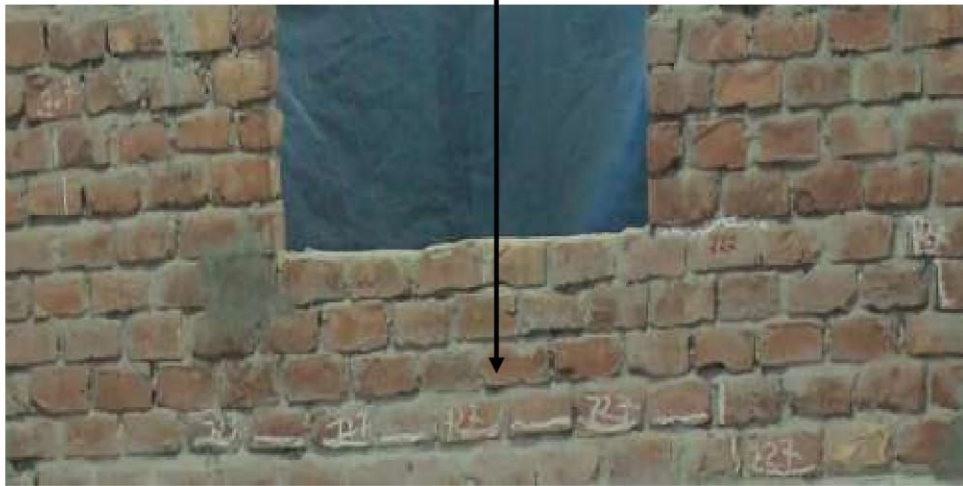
Specimen 3, Instrumentation and first crack formation of two storied single bay infill frame having window opening
